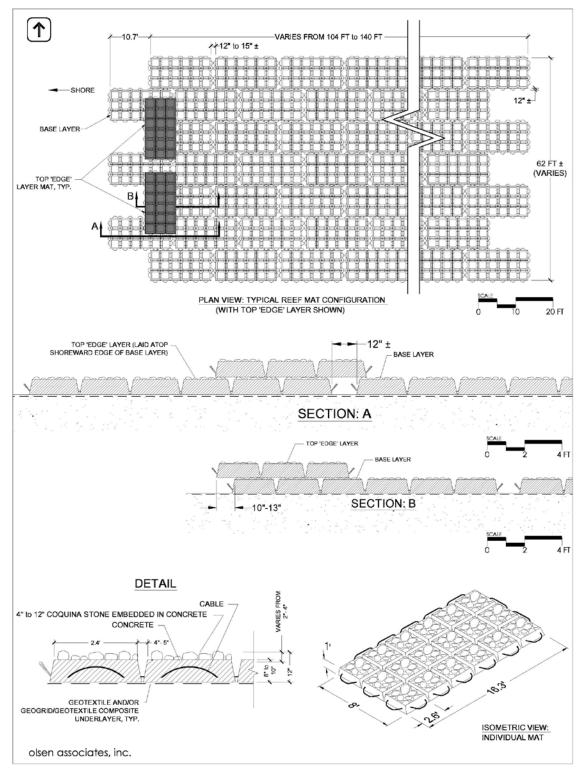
Plan and elevation view of typical articulated reef-mat mitigation structure.
